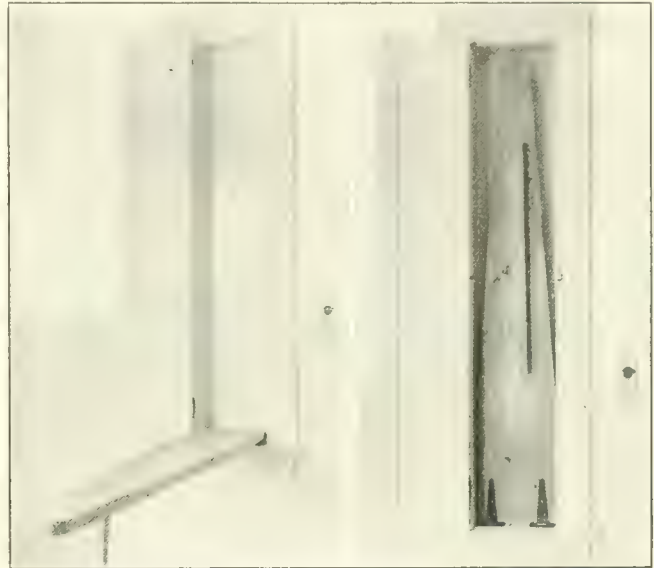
Folding ironing board installed in house built by Shaw Bros. at 345 Spadina Road, Toronto. When not in use the ironing board folds into cupboard in wall, where it is out of the way and protected from dust.
